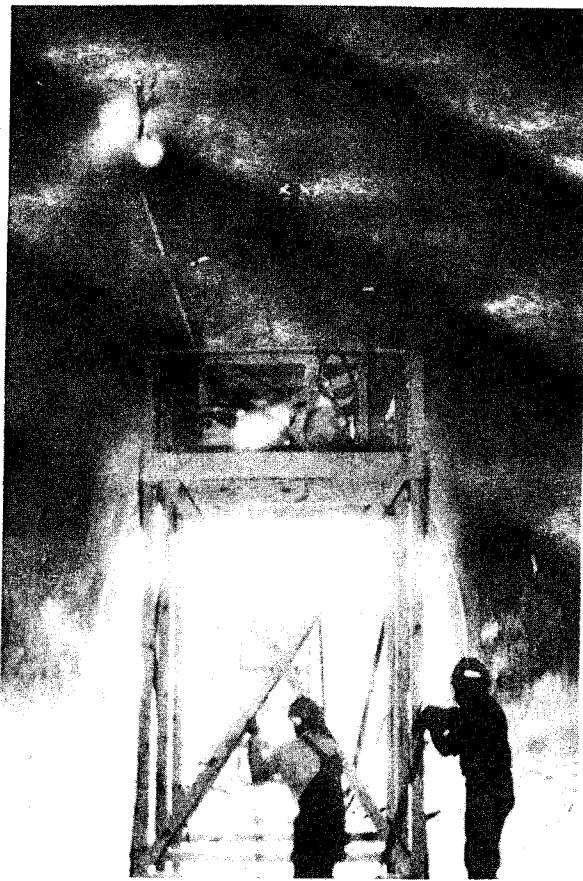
Drilling exploratory hole in conduit crown, Arkabutla Dam, 1977
